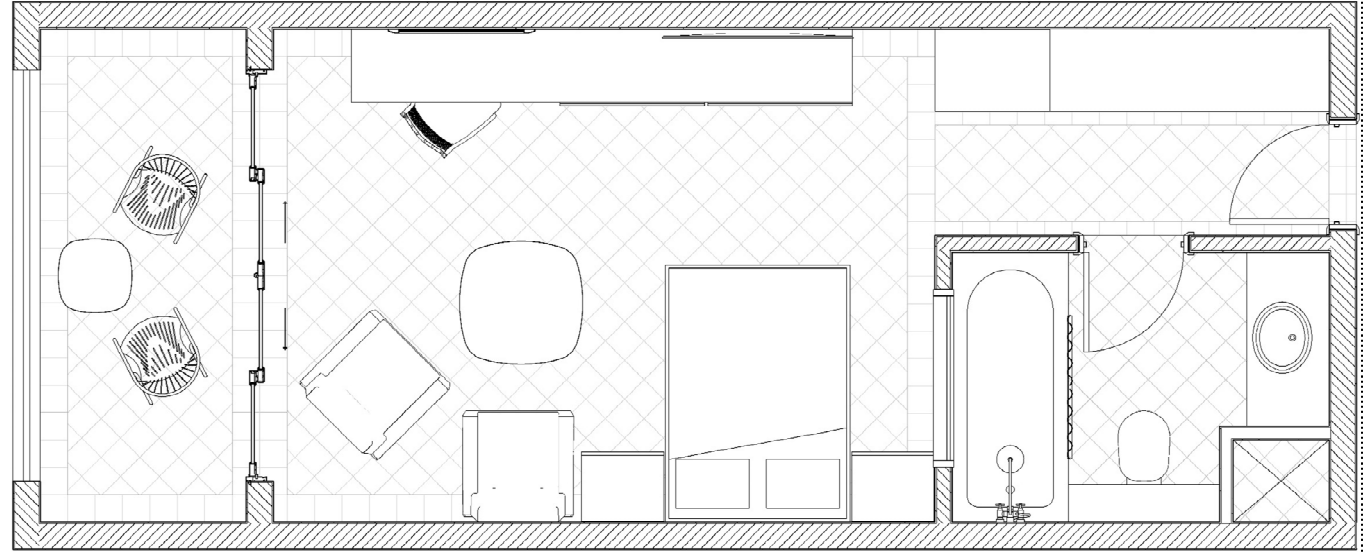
Diani Reef Beach Resort room floor plan.
